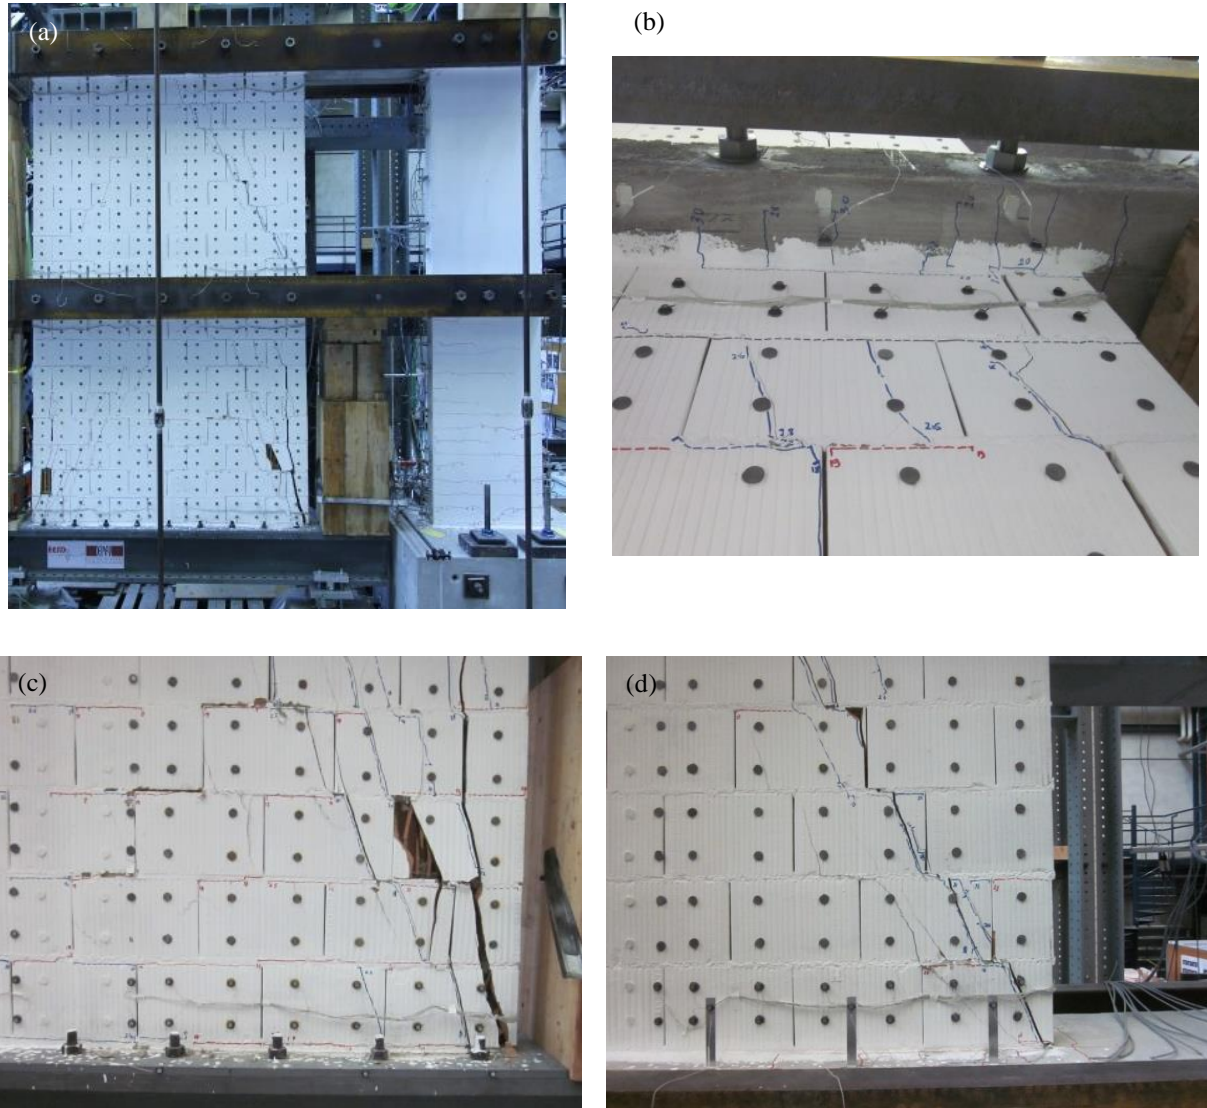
Crack pattern at LS31, $\delta = +0.6\%$. (a) specimen; (b) RC first storey beam, curvature penetration into the URM wall; (c, d): compressed corner of the first and second storey of the URM wall.
